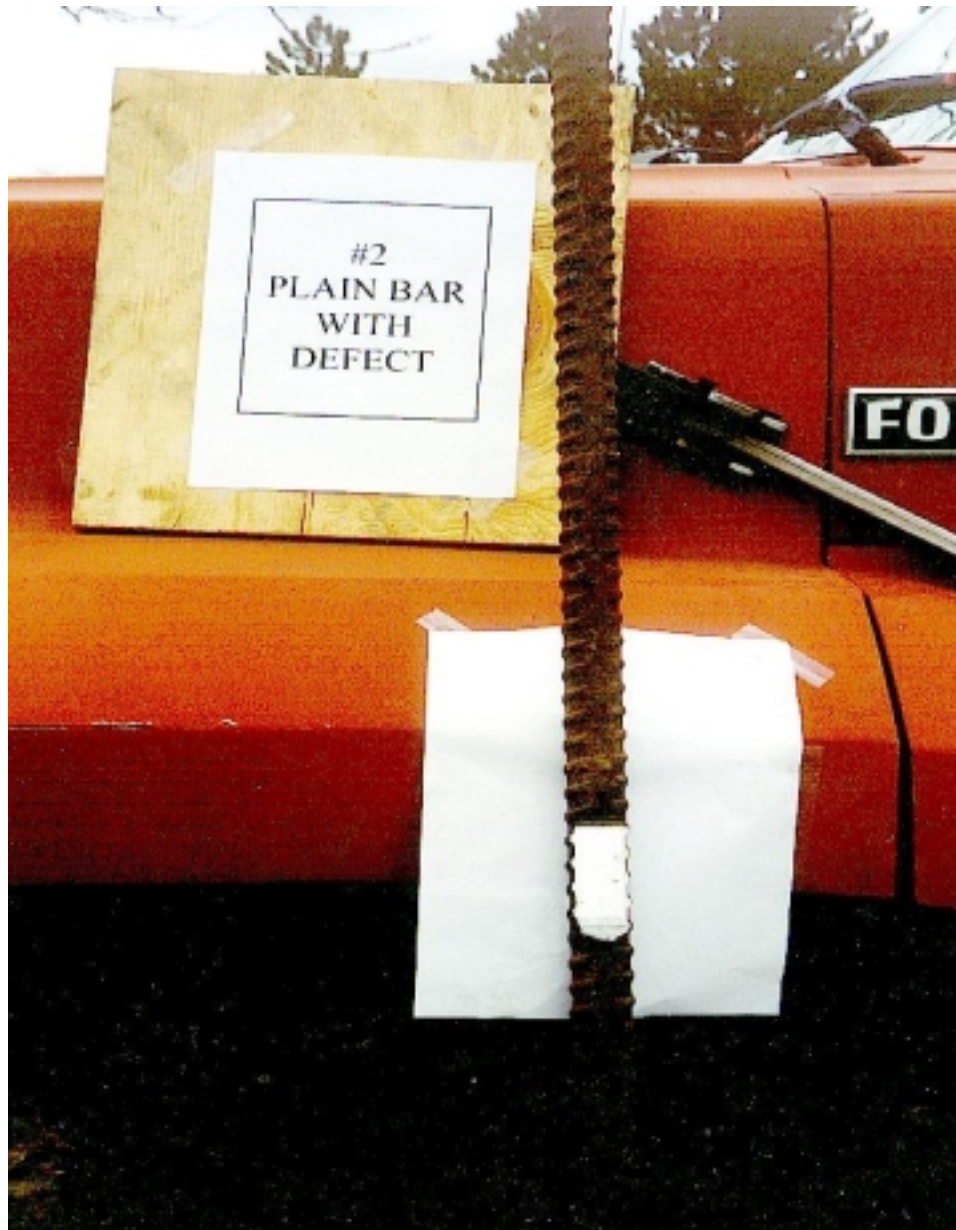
(b): In-Situ Specimen #2: Plain Bar With Defect.
